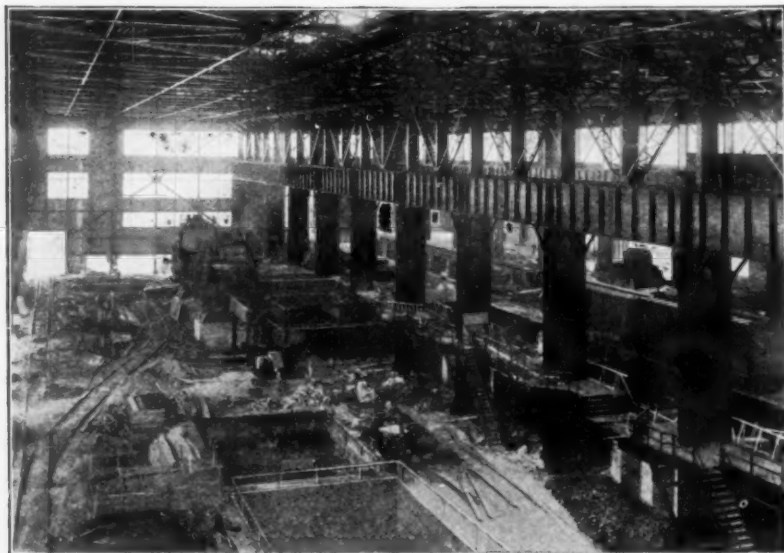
POURING AISLE OF OPEN-HEARTH BUILDING LOOKING EAST FROM CRANE GIRDER, JULY 14, 1920
